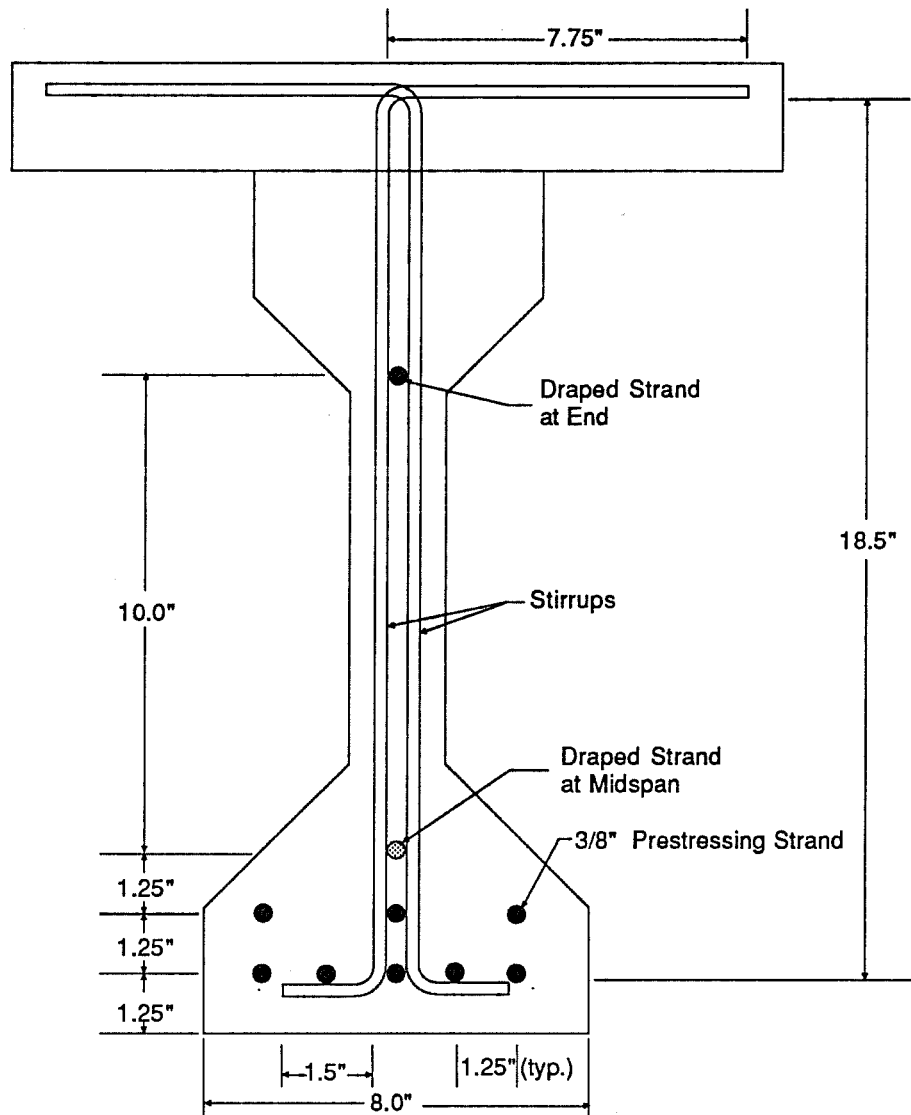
Strand locations and stirrup details for Specimens 3-3 and 3-4.
